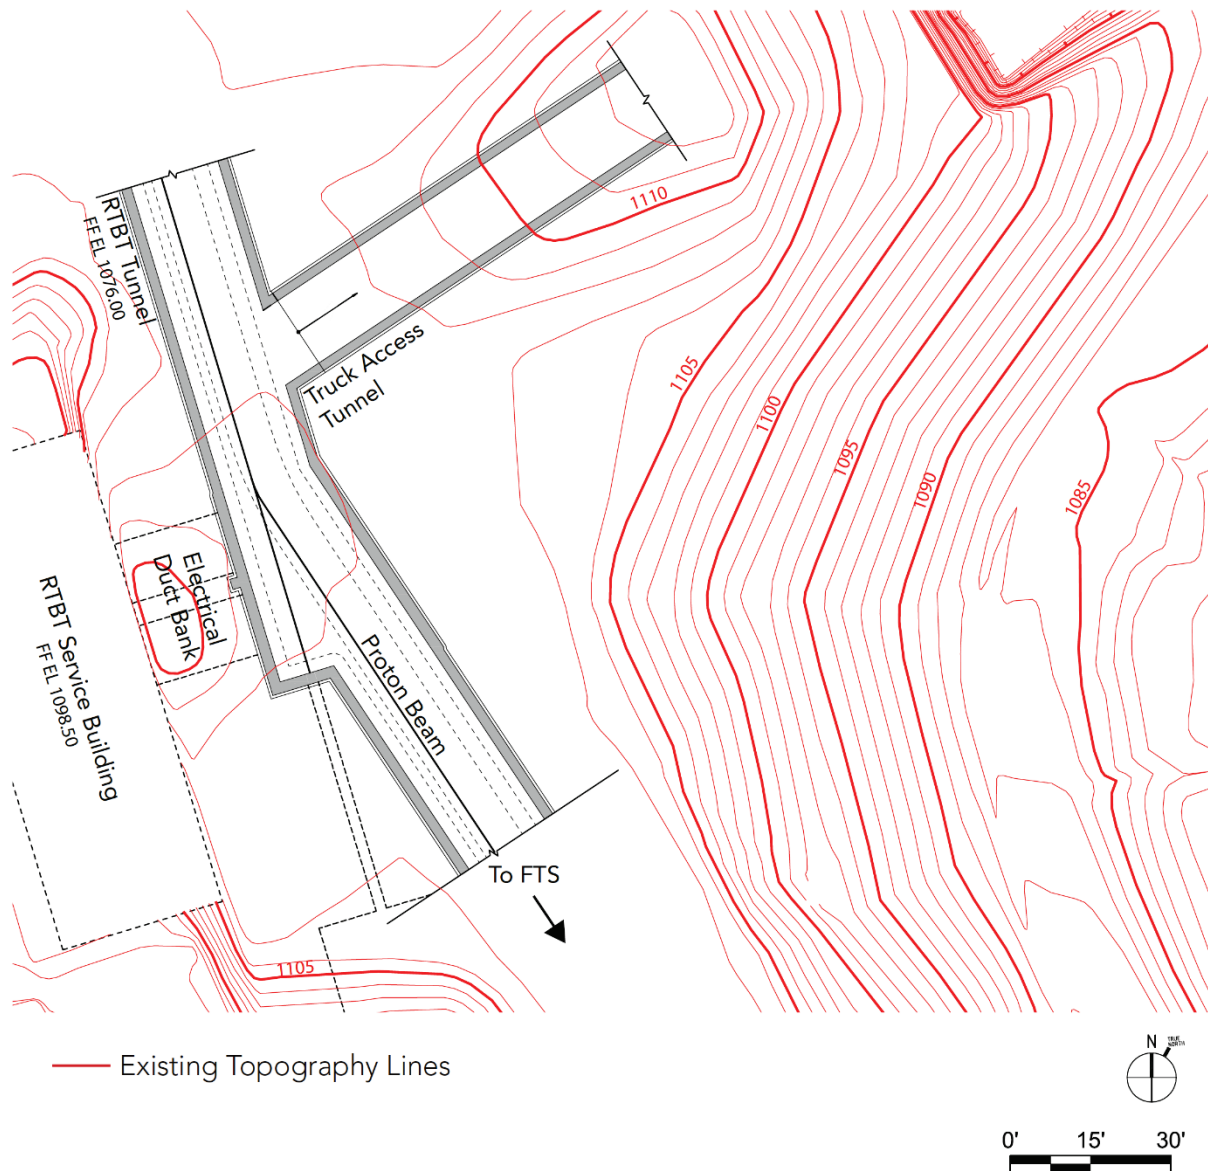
The existing RTBT tunnel with existing grades indicated.
